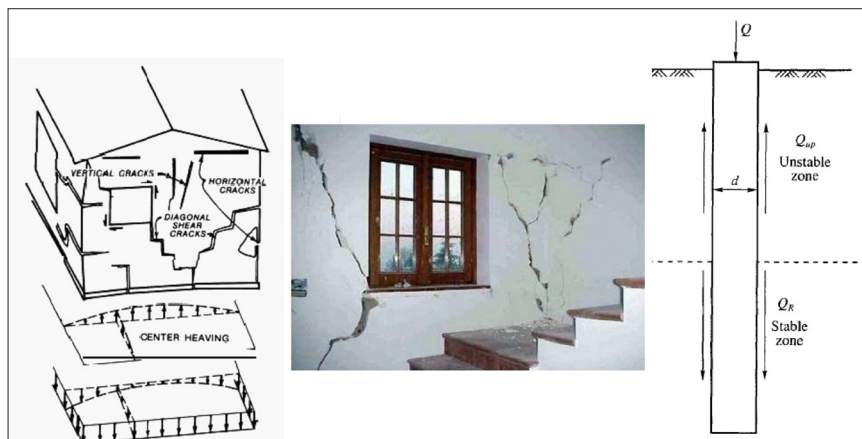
Effect of swelling on differential settlement of lightweight buildings supported by spread foundations (left) and on the tensile force on piles.
